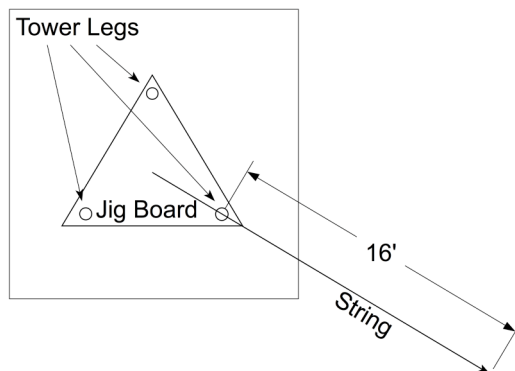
Diagram of a jig used to mark guy wire anchor positions for a 10-meter tower.
